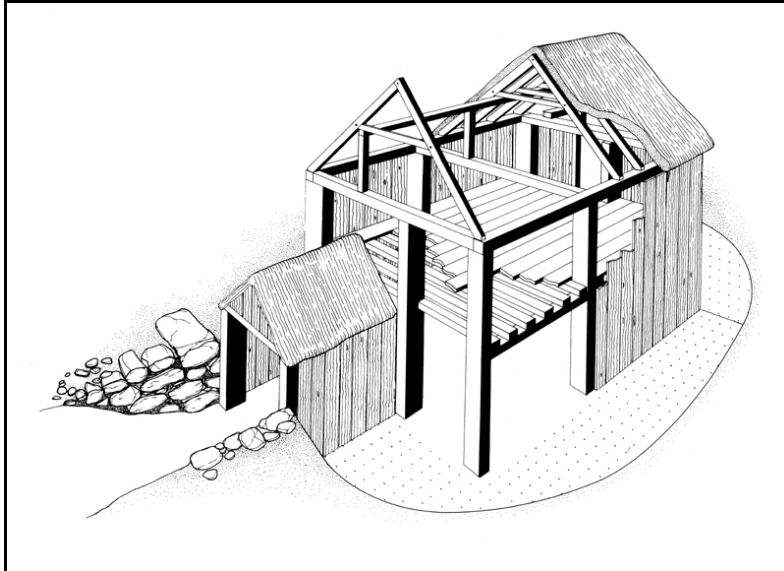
Artistic reconstruction of sunken building in Peter Street, Waterford (after Hurley et al. 1997, 48).
